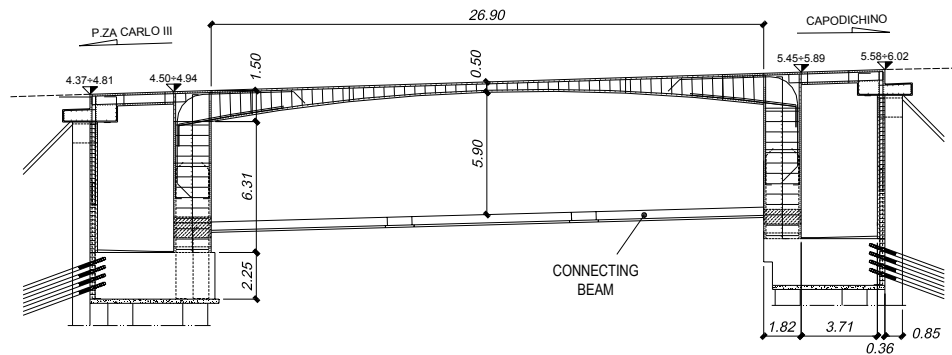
Bridge section, with reinforcements and principal geometrical dimensions
